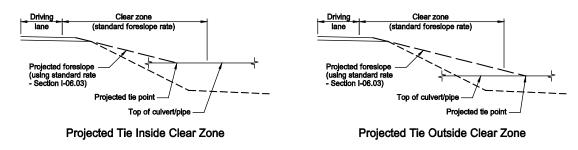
Foreslope Flattening at Box Culvert or Structural Plate Pipe
